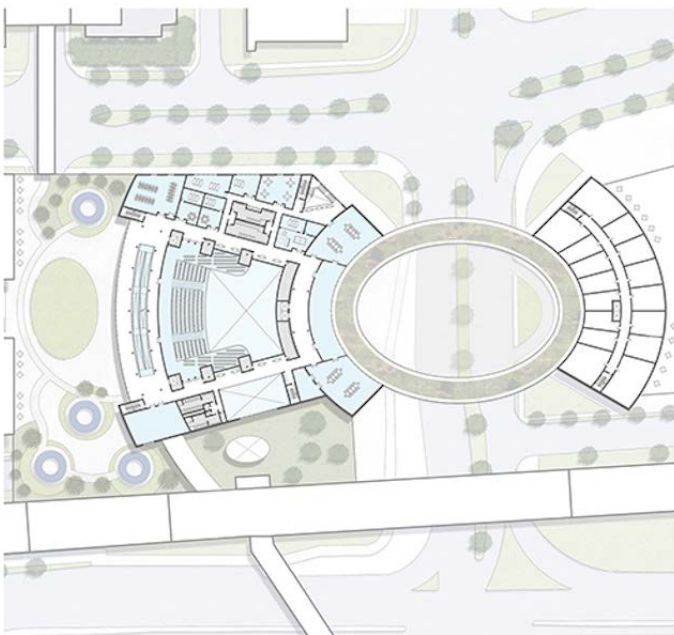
Sixth Floor Plan – Esports Arena Upper Level (Source: Jefferson Choi)
